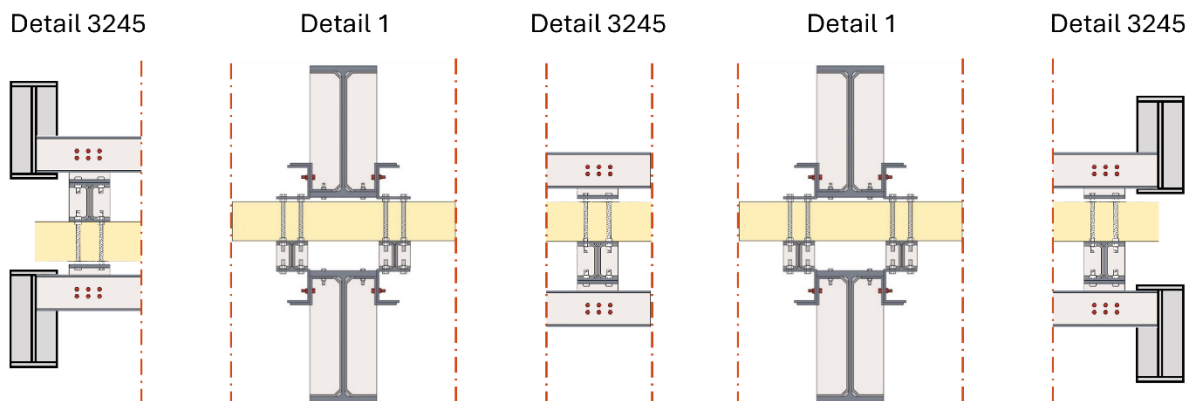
Building configuration with firewall orthogonal to the portal frames equipped with Detail 1 + Detail 3245.
